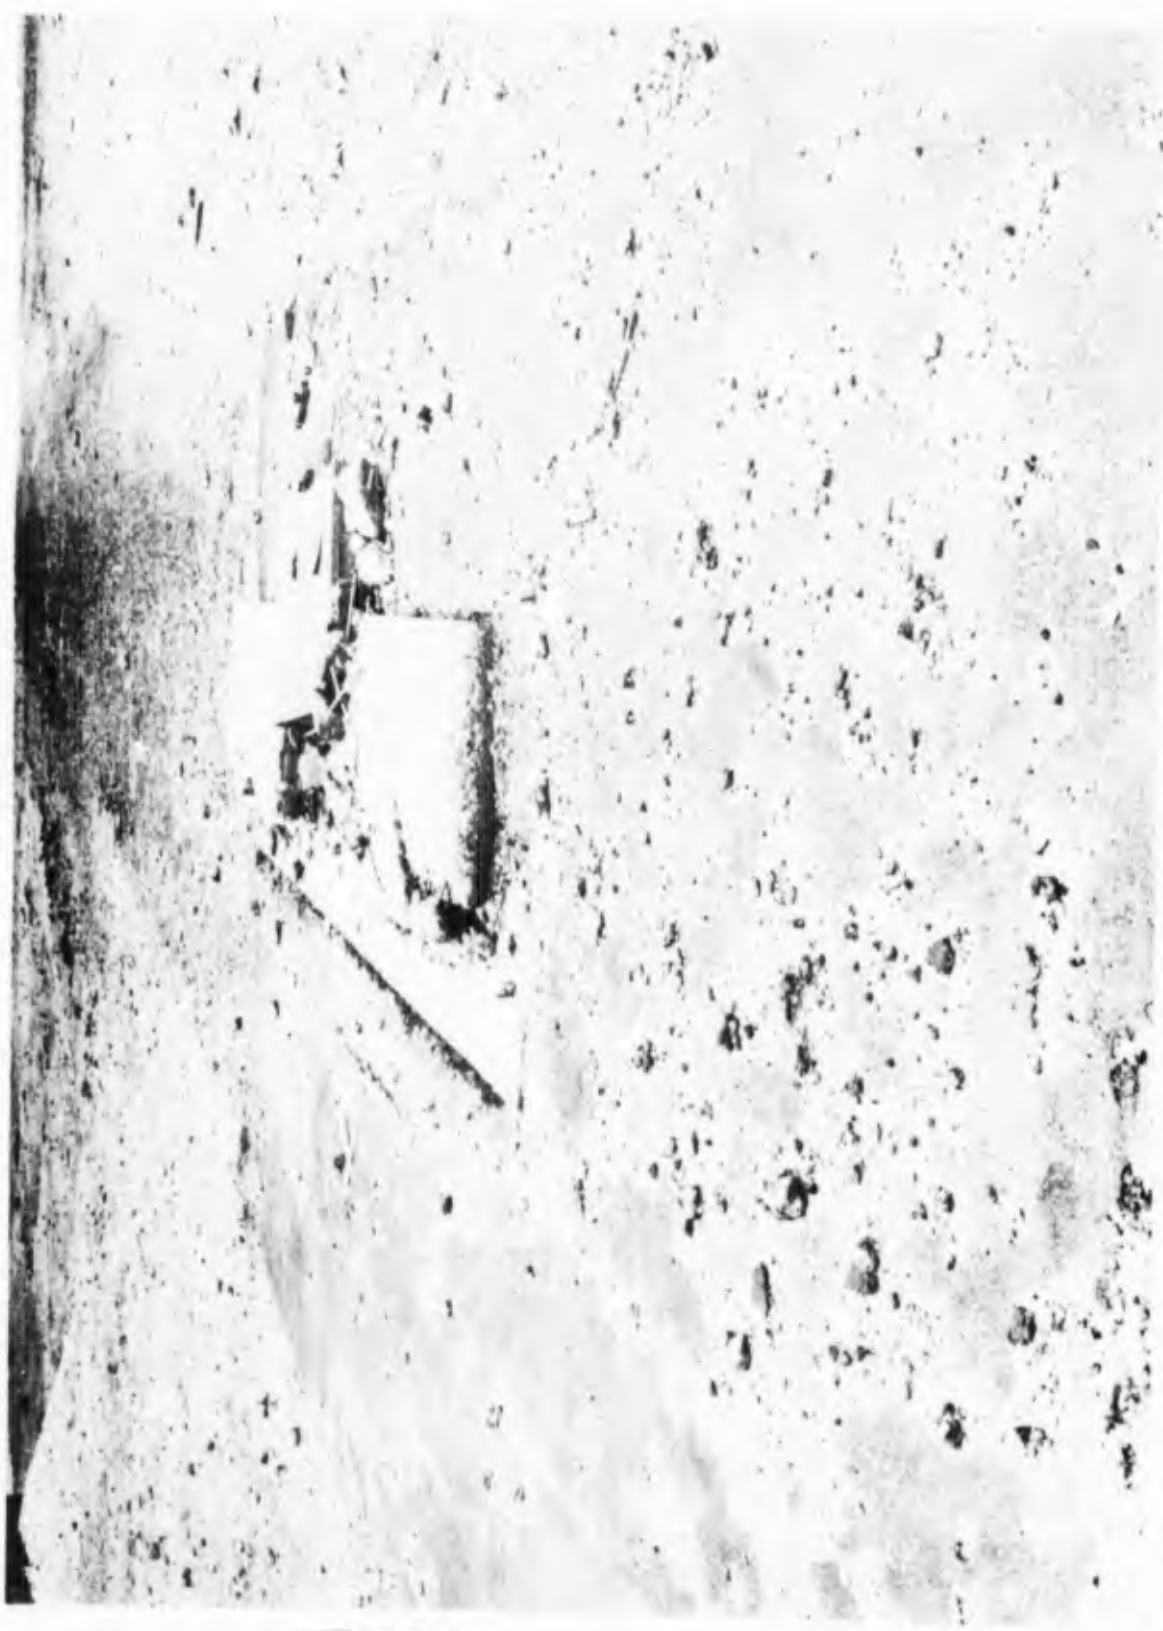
Test Easy, Station 20b; View of Wall away from Zero
